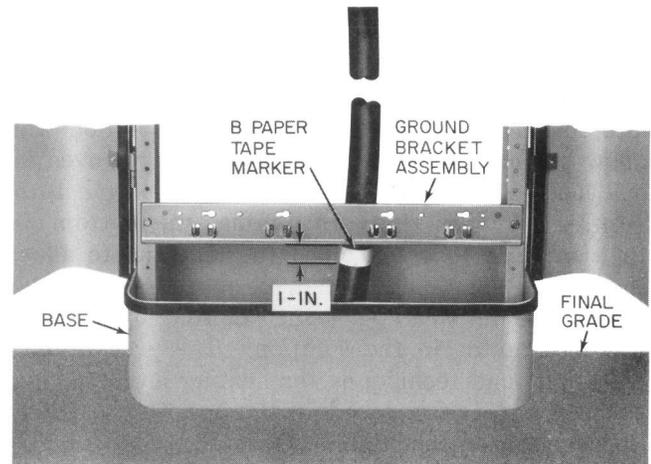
Marking Cable for Sheath Opening (UP-1254)
